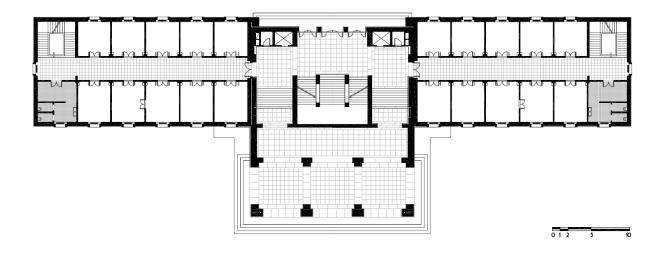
G. Bosio, Casa del Fascio in Tirana. 1939-40, the ground floor plan, (Tirana, Central Technical Construction Archive) [7]
